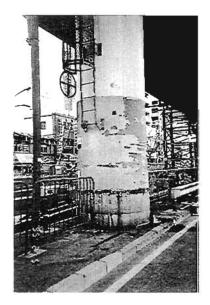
Hanshin Expressway - Damage to Circular Steel Pier Column freshly flaked paint on column near Kobe centre indicates strong north-south cyclic action Plate 6.49 Hanshin Expressway - Damage to Rectangular Steel Pier Column extent of buckle indicated by Dr Peter Merriman
